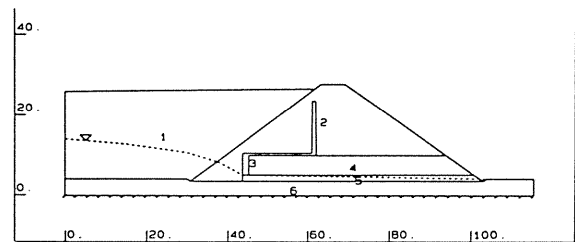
Typical geometry of eastern section of Tailings Dam wall.
